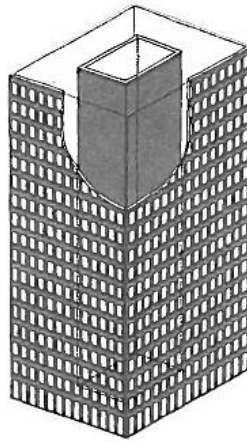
A core of shear walls working together with a framed tube creating the tube in a tube structural system (Khan, 2004)
